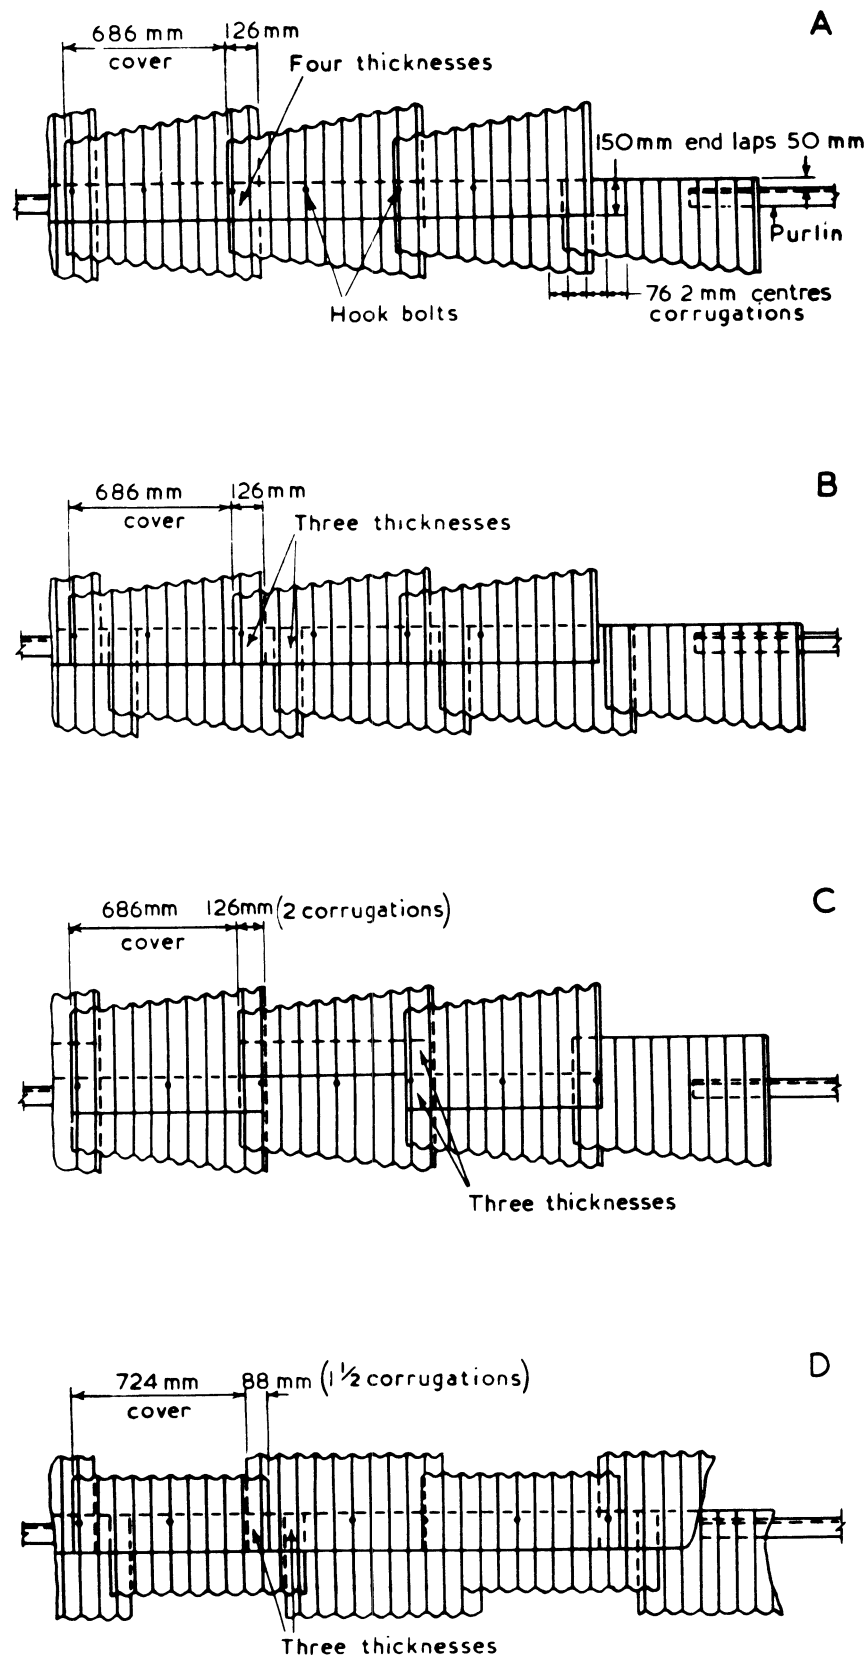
Typical layouts and end laps of 10/76.2 mm corrugated steel sheeting (continued)
